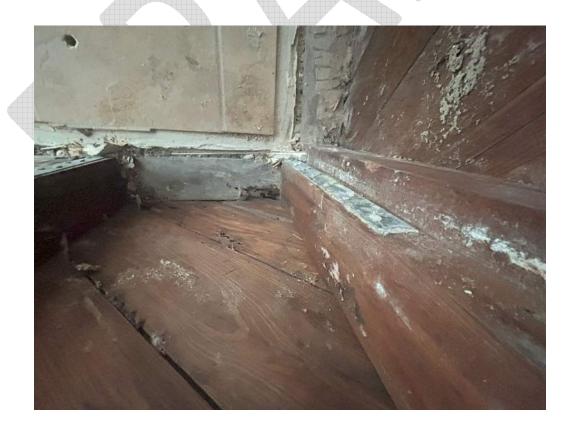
Wooden Bottom Plate Rutten and Loosen at Exterior Wall Wood Frame.
